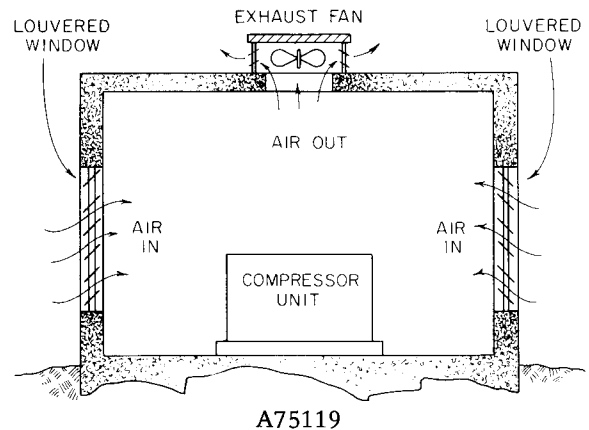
TYPICAL COMPRESSOR ROOM
